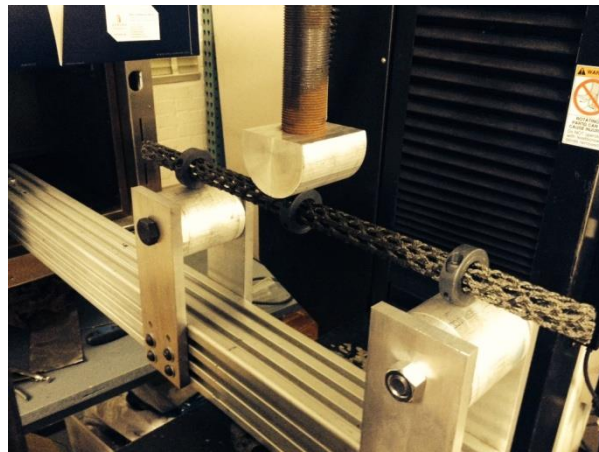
1 inch O-ACS being tested in modified 3 point bending
